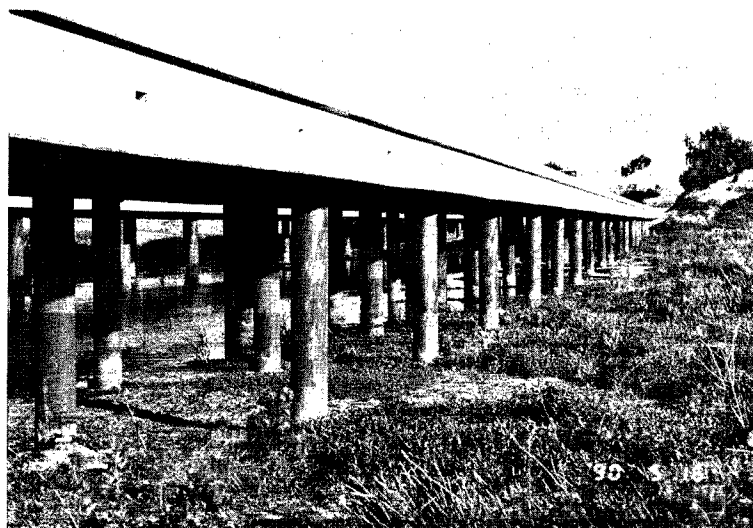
Reconstructed Struve Slough Bridge (photographed on 5/16/90).
